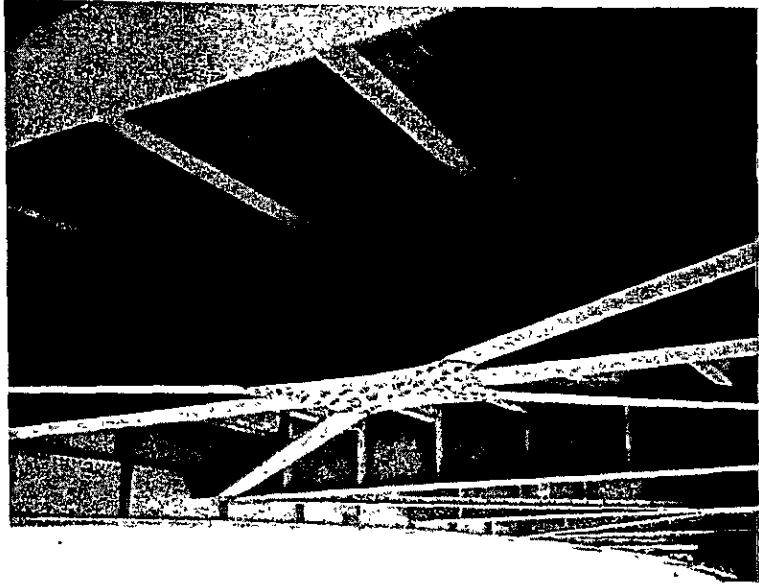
Stringer, Cross Beam and Lower Lateral
